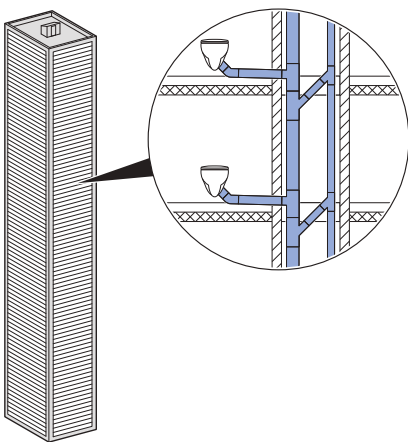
Conventional drainage of high-rise buildings with an additional ventilation pipe (secondary ventilation)
